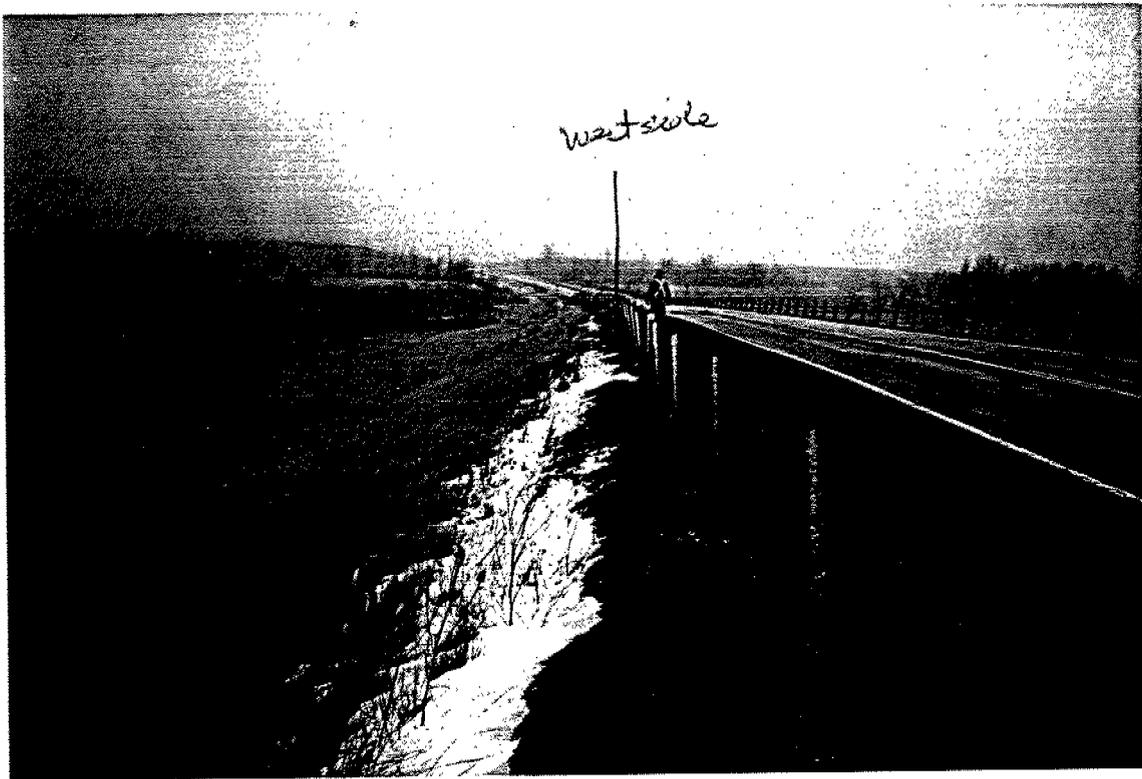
NORTH APPROACH FILL, UPPER SLOPE
